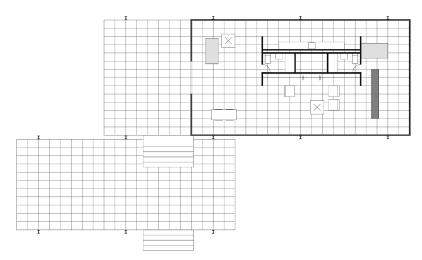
Farnsworth House by Mies van der Rohe in Plano, Ilinois – floor plan
